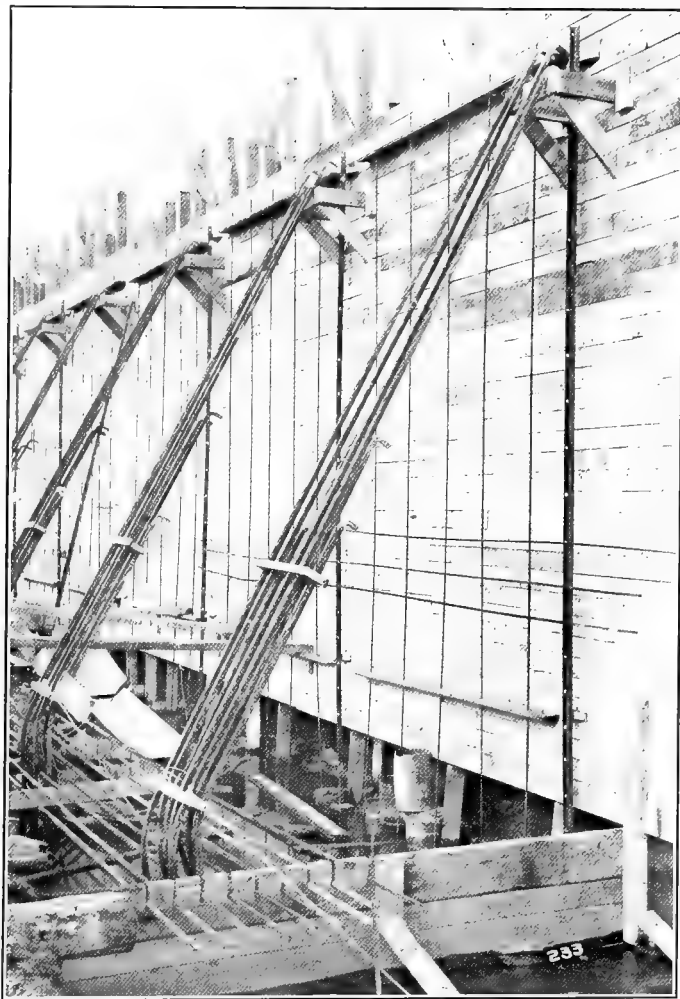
REINFORCEMENT IN PLACE, BUFFALO RETAINING WALL.
